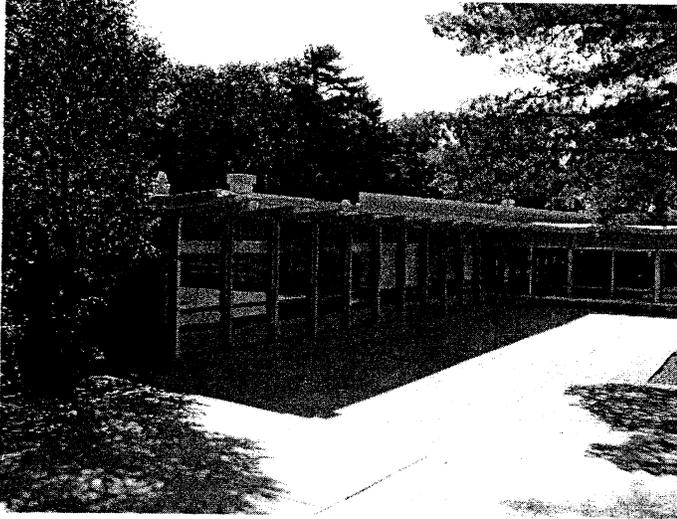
Overview photo showing Harris Ave side of the Pollard Middle School. This photo shows a section of the 1956 (original) construction.
